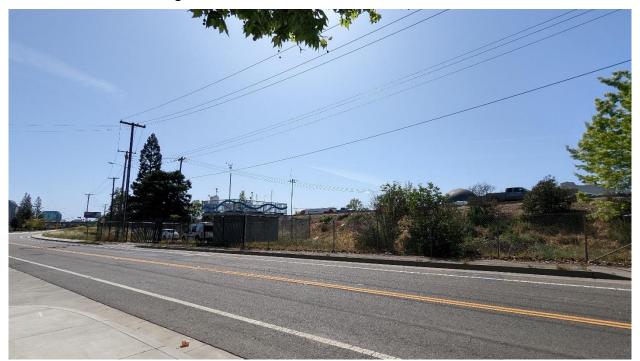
Panoramic Photo Looking North from Sacramento-Bercut Dr.
